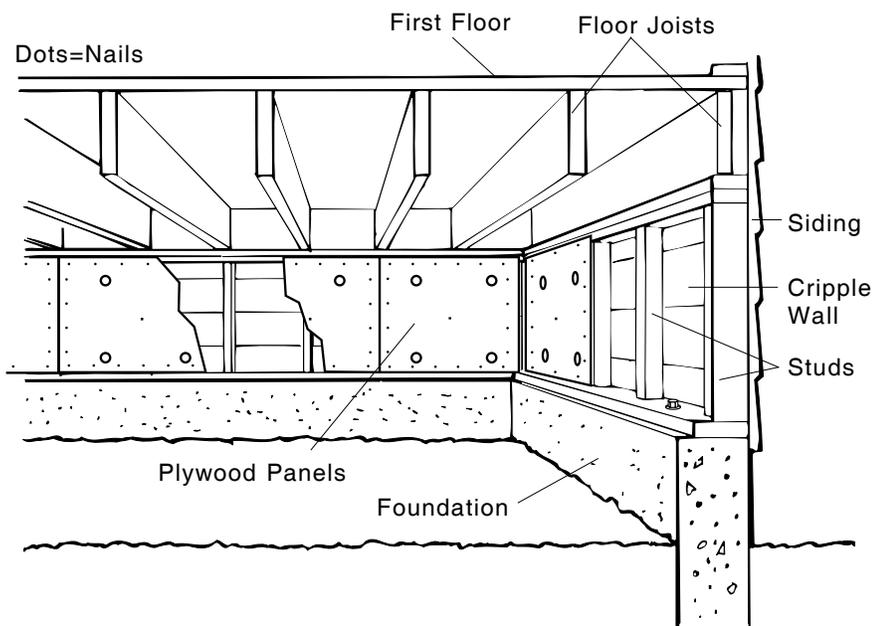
Plywood strengthens weak cripple walls. *If your home has a cripple wall between the foundation and the first floor, and the wall is not braced with plywood sheathing, the house may collapse during an earthquake.
